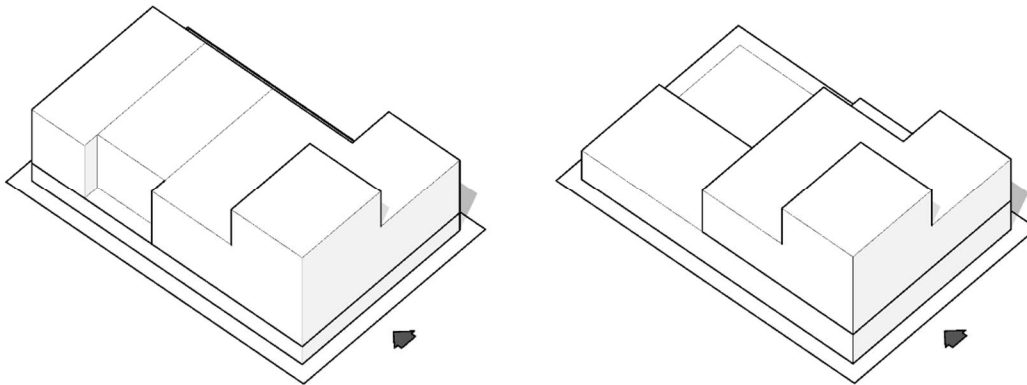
Building massings should have the largest massing oriented towards the primary street / corner
